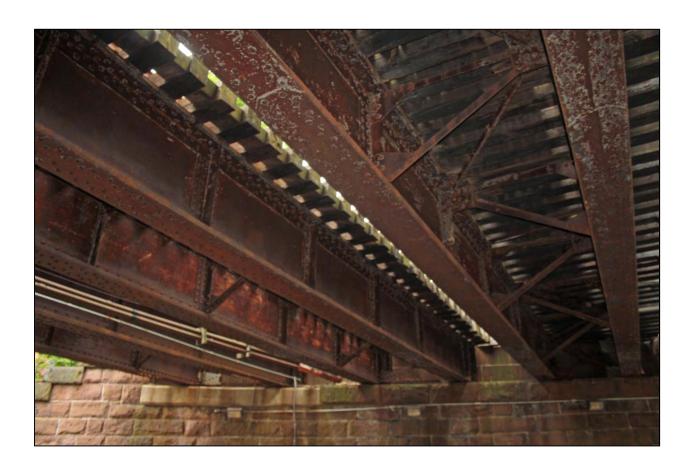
Ann Street Bridge, west side of bridge and north abutment, camera facing northeast.
